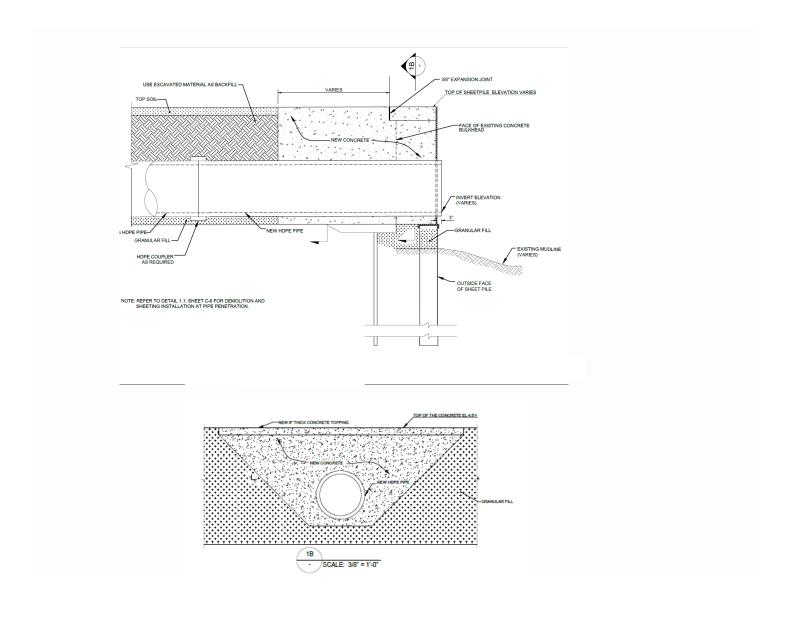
Transverse section of the outfall (Tetra Tech, 2018)
